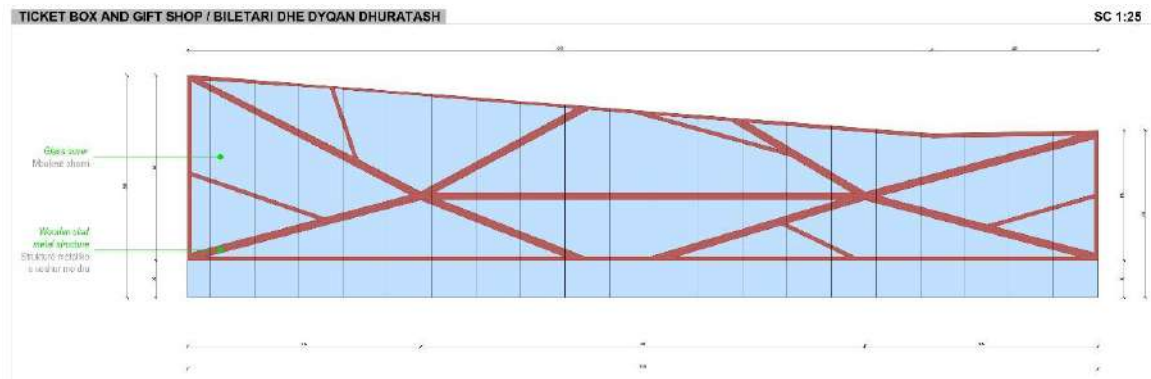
The new ticket box and gifts' shop, Proposal, Plan
